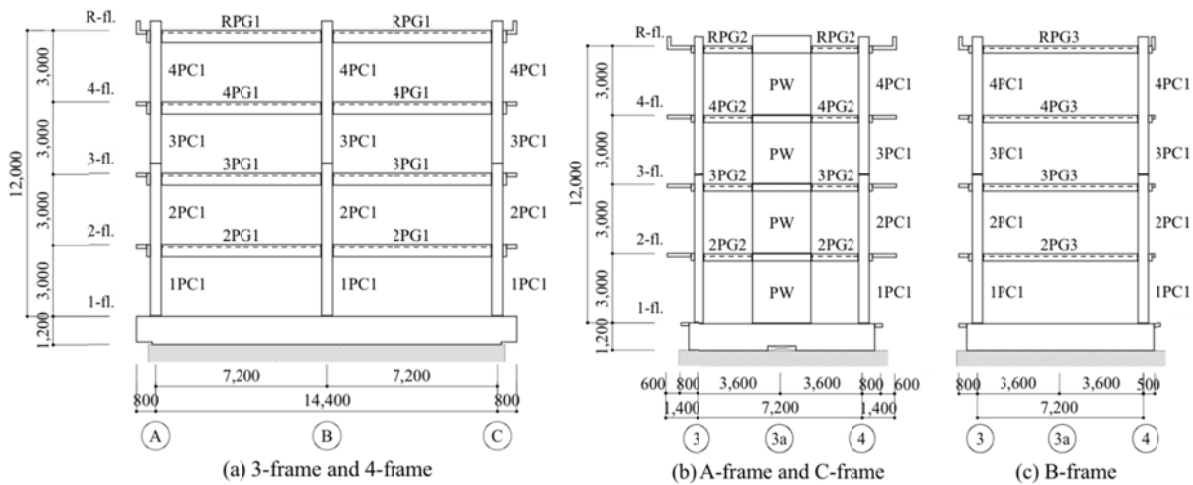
Elevation view of the specimen (Unit: mm)
